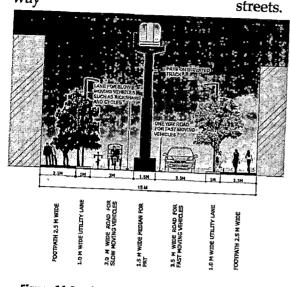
Section of Hall Bazar- one way road (Source: by Author)
